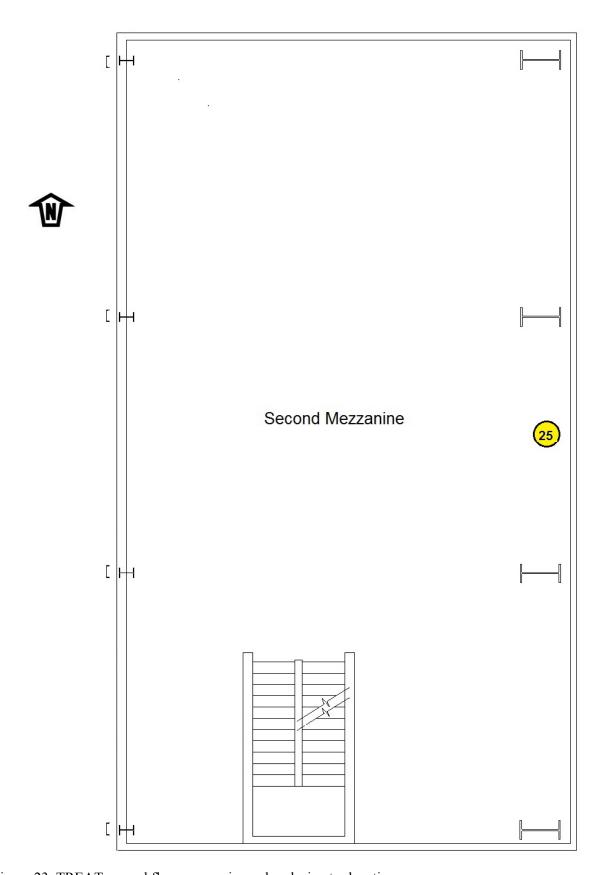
TREAT second floor mezzanine radon dosimeter location.
